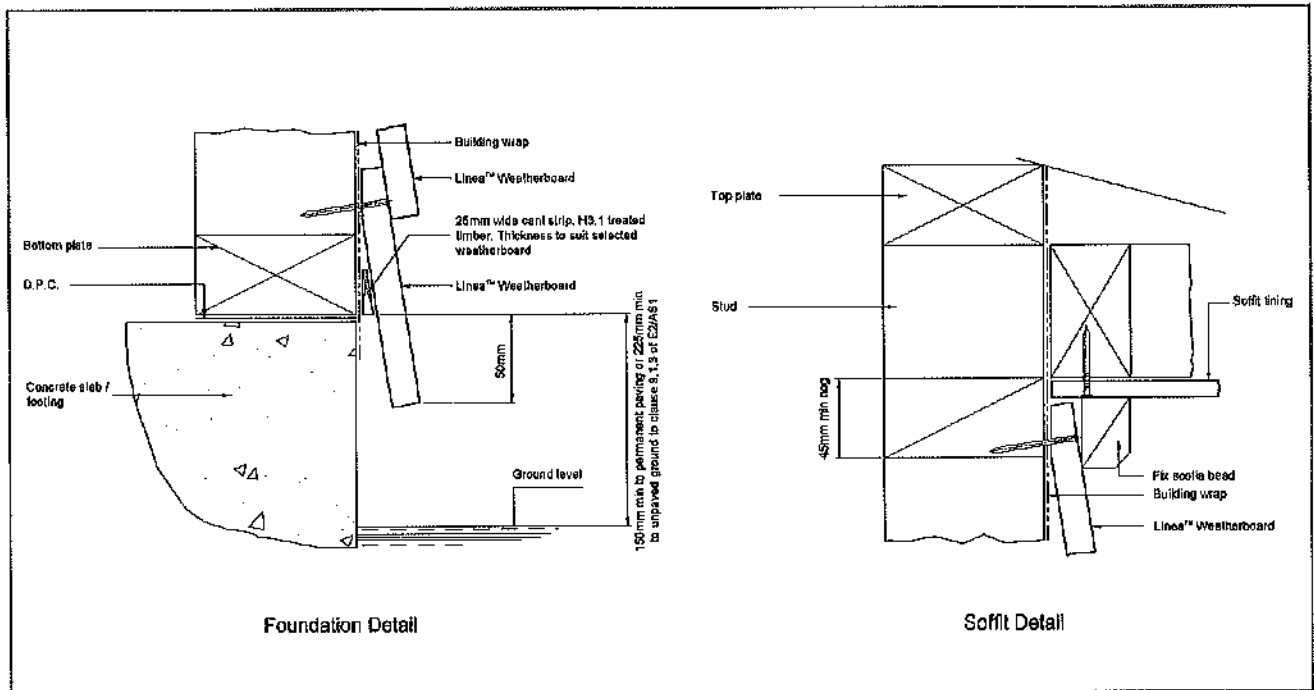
DIRECT FIX CONCRETE SLAB AND SOFFIT
